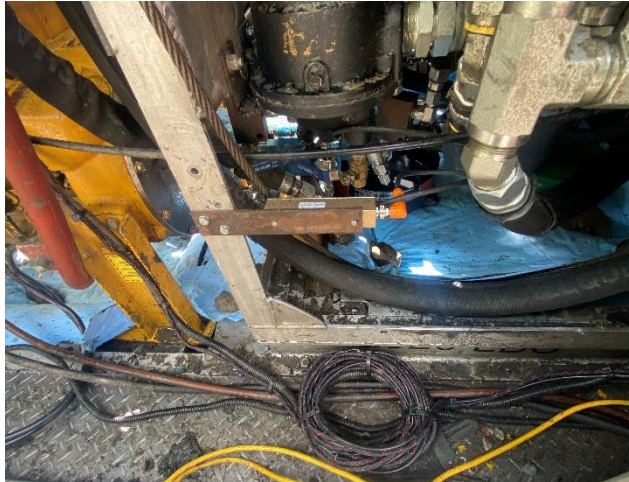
Azimuth Sensor mounted, Inside Hydraulic Tank Frame
